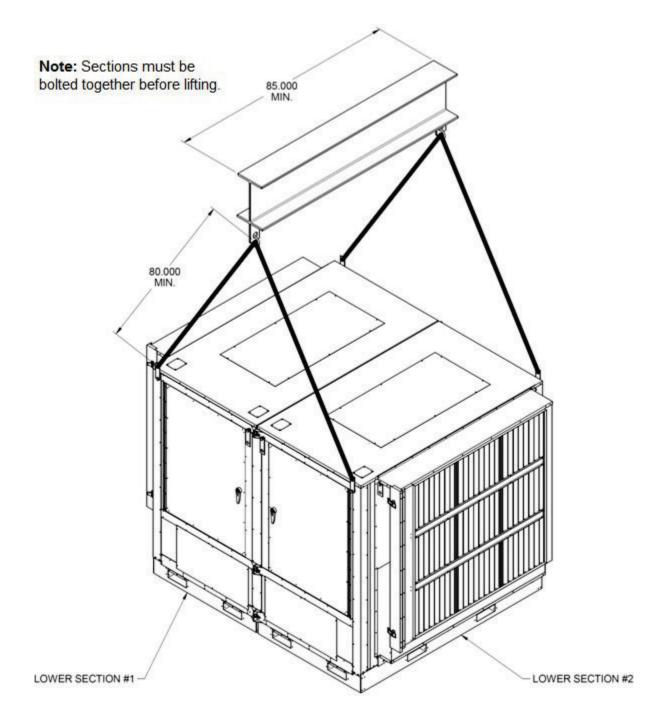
Two Piece Dual Unit Coil Section Lifting Details
